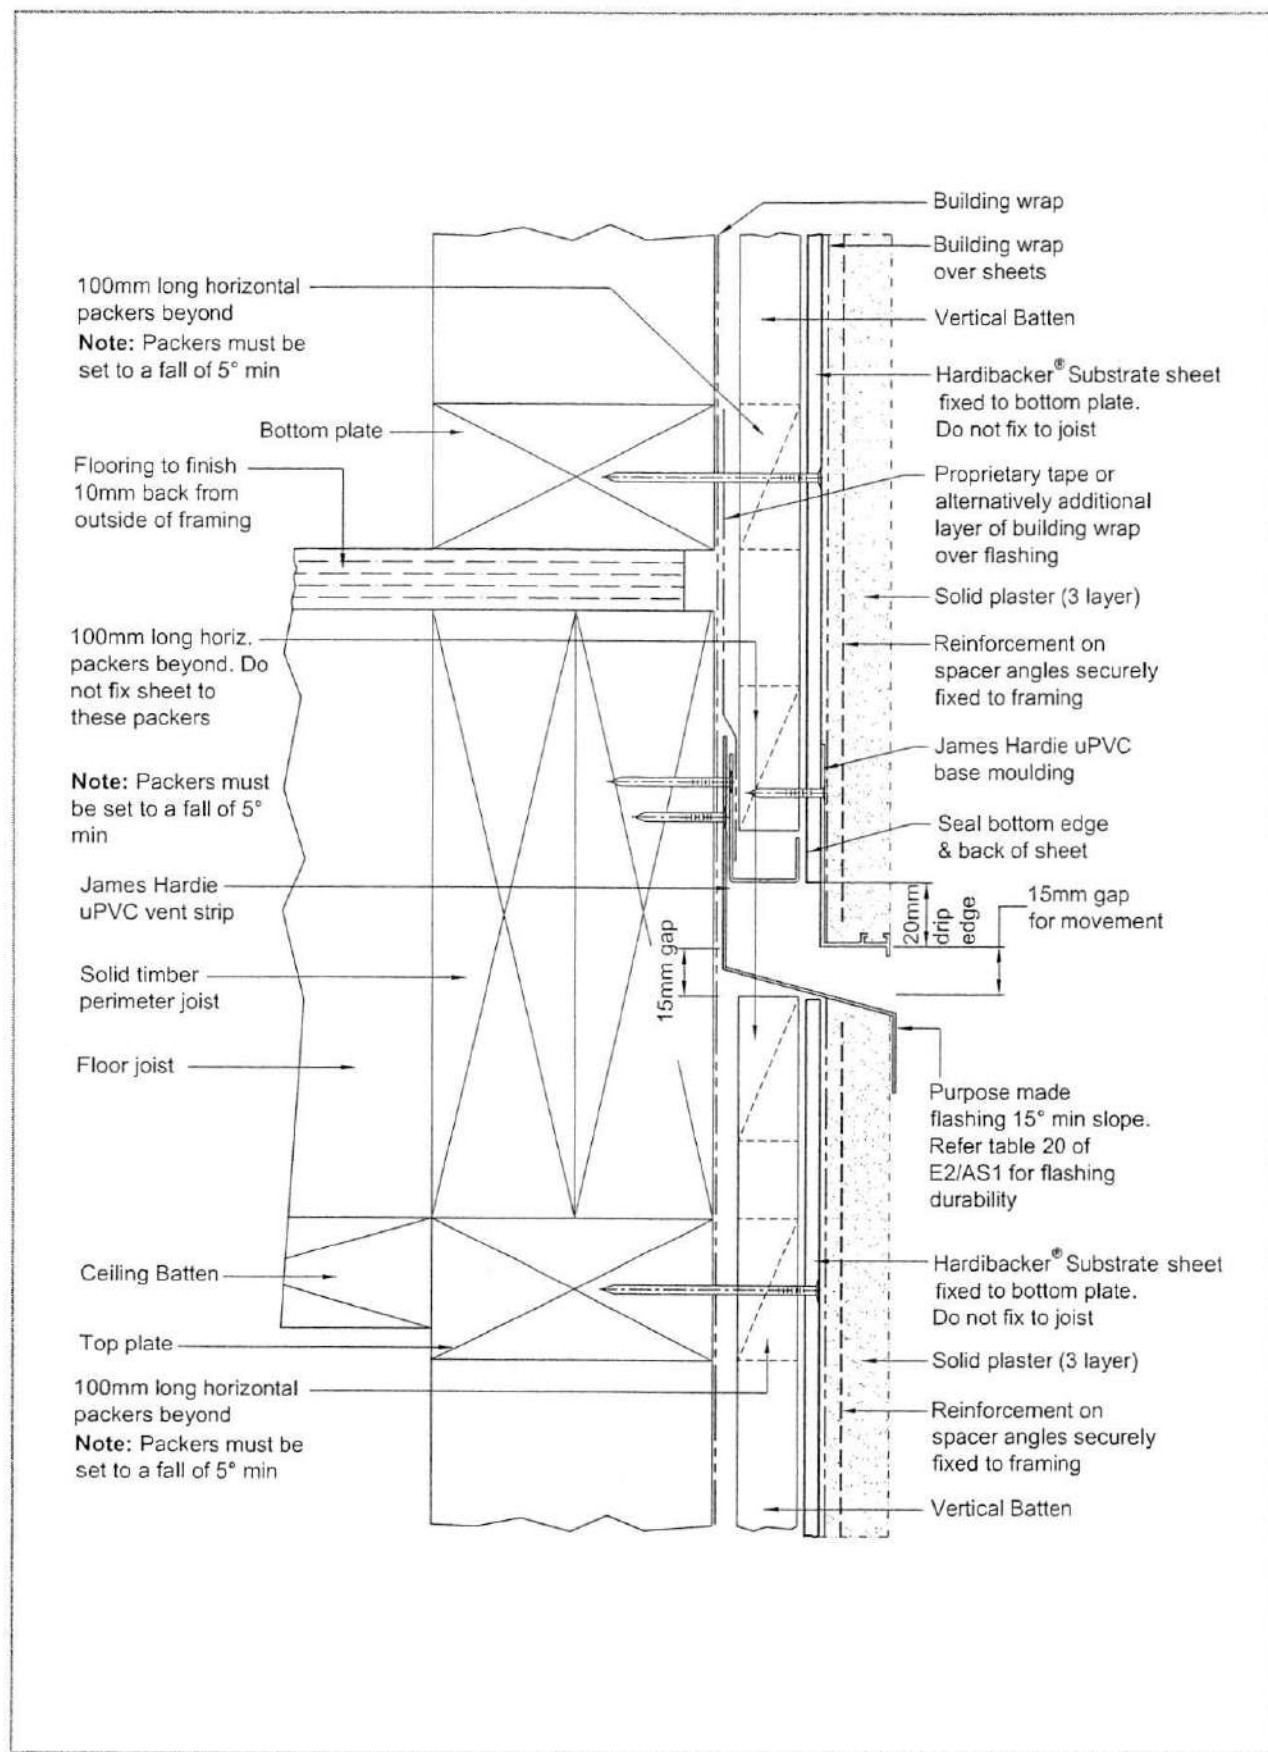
HORIZONTAL DRAINAGE JOINT
